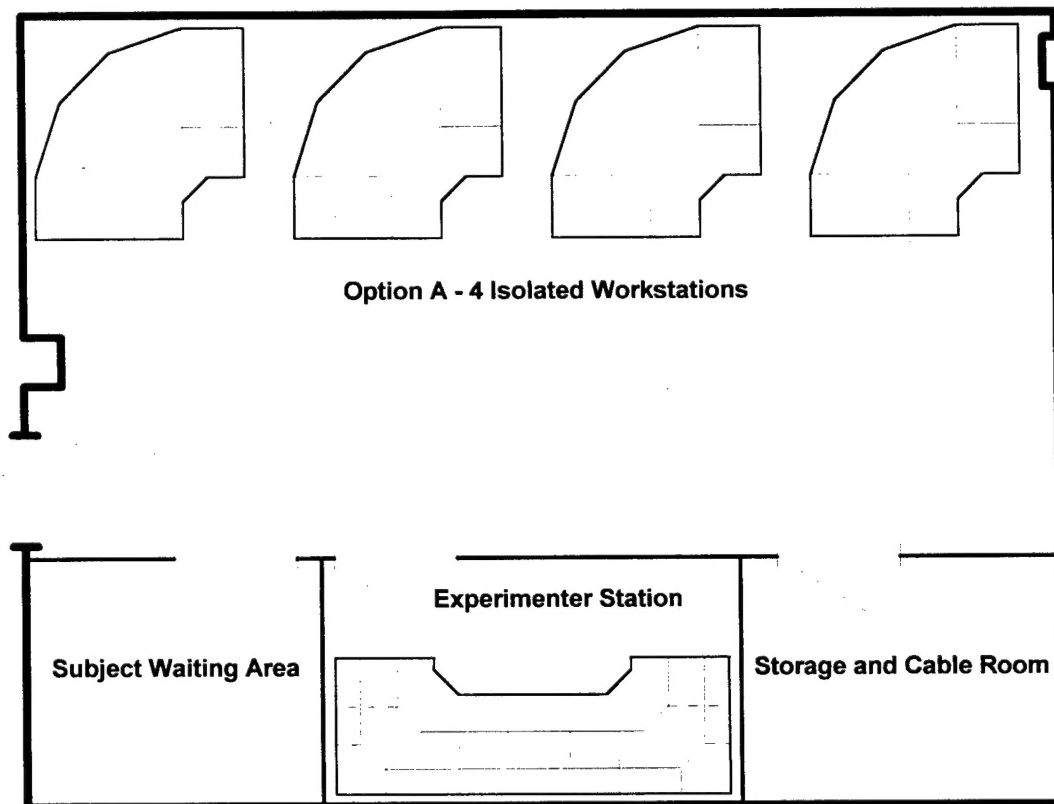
CERTT Floor Plan - Console Layout Option A (*drawn to scale*).
